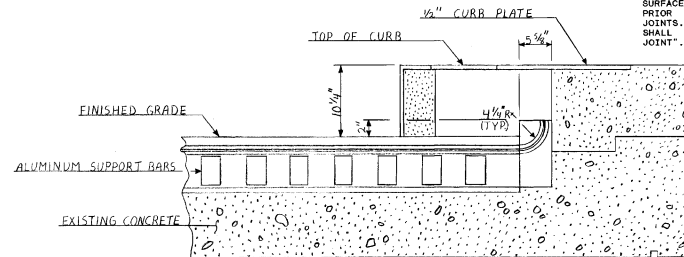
DETAILS SHOWING LIMITS OF RAPID SETTING CONCRETE.
